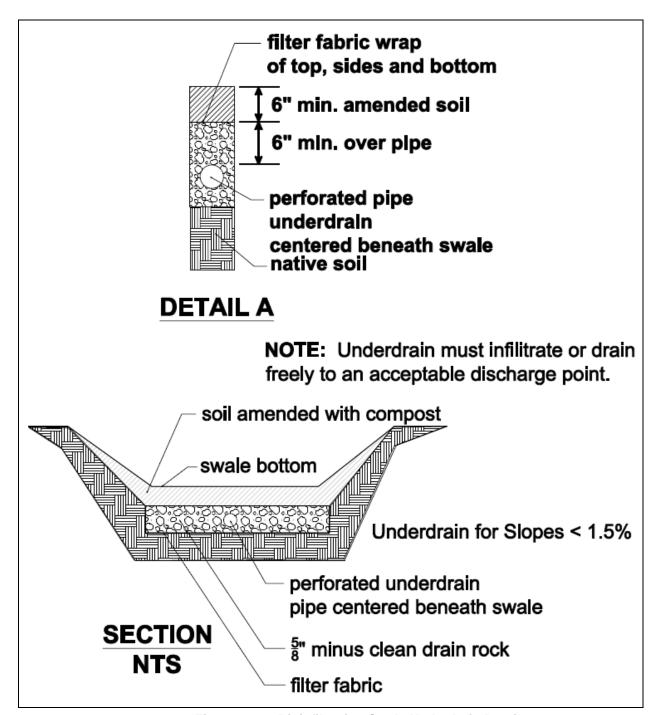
Bioinfiltration Swale Underdrain Detail
